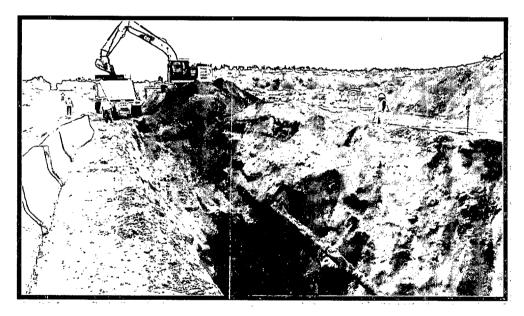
Final excavation extents measured over 130 feet long with depths to 35 feet below grade.
